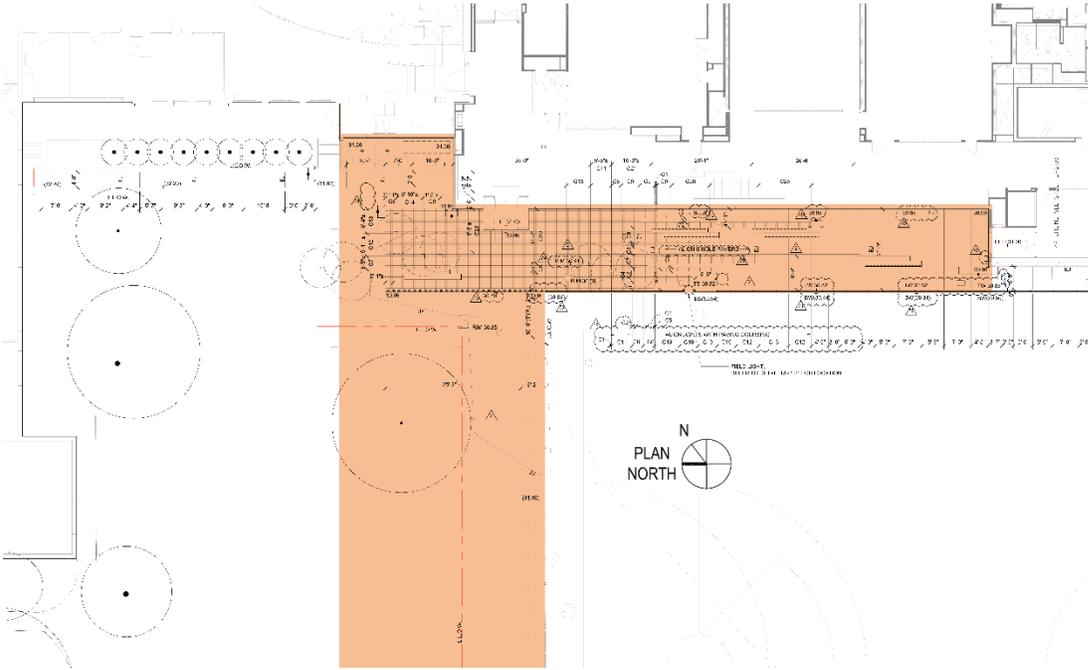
First Floor North Plan - Courtyard Plaza and Entrance
